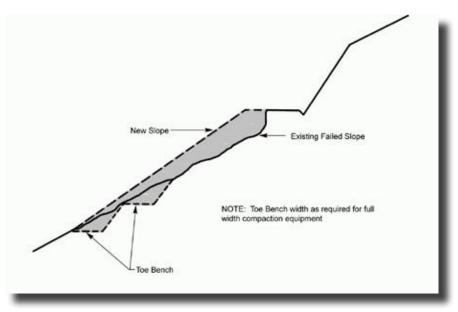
A typical fill toe foundation bench arrangement (Courtesy of Mark Truebe, Willamette NF).
